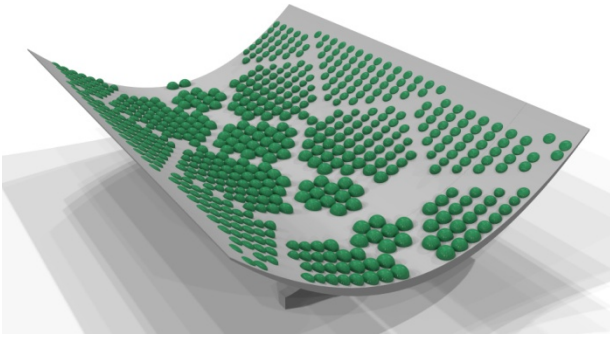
Concept of a large aperture parabolic trough collector with spherical void formers and global bracings
